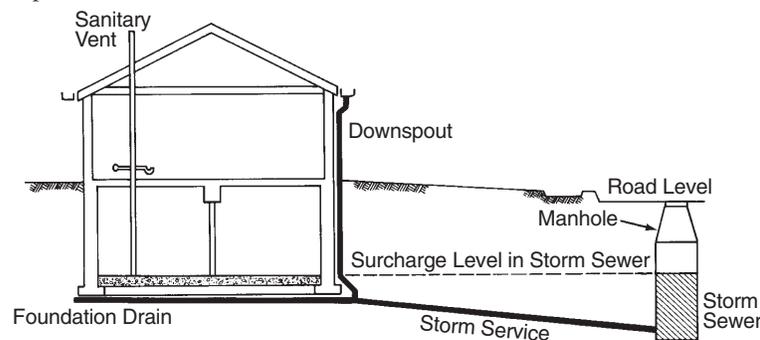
Foundation drain and downspout connected to storm sewer by gravity
